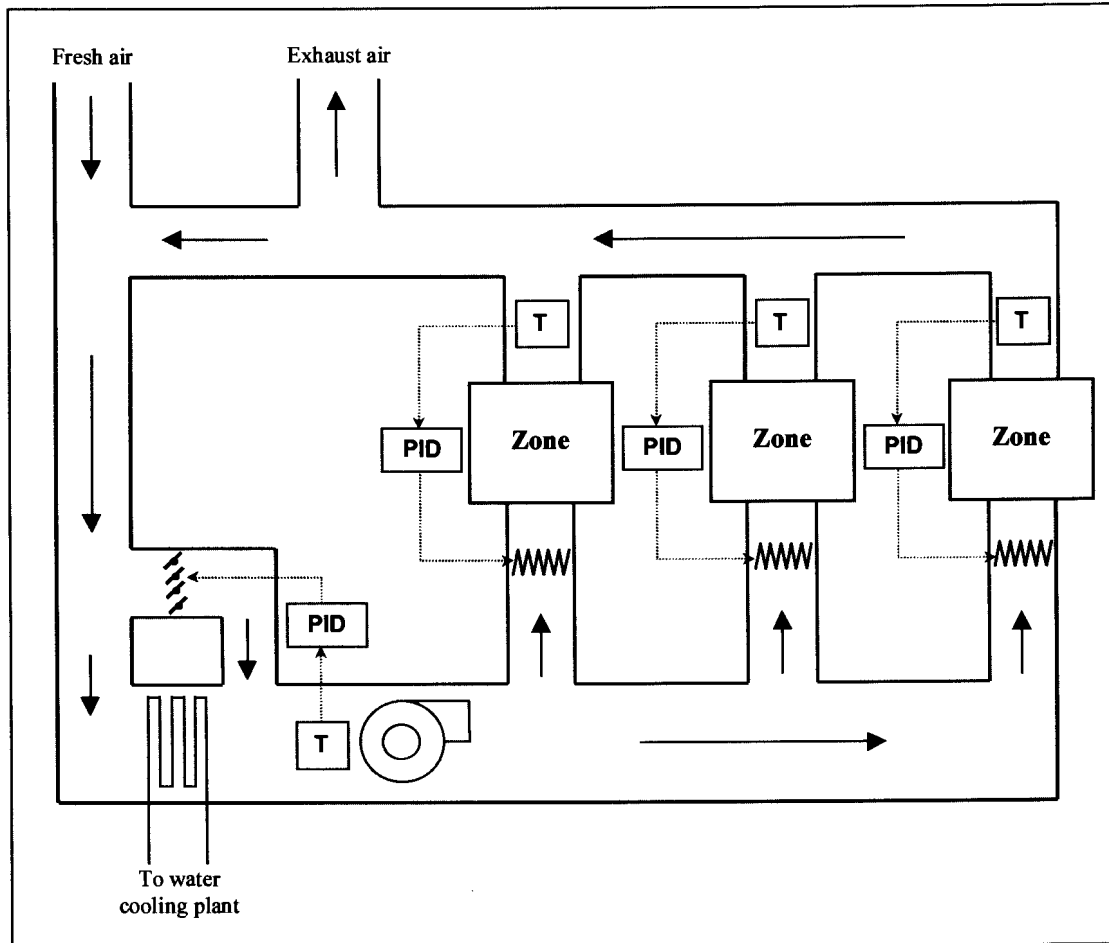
Schematic layout of an air handling unit with coil bypass control
